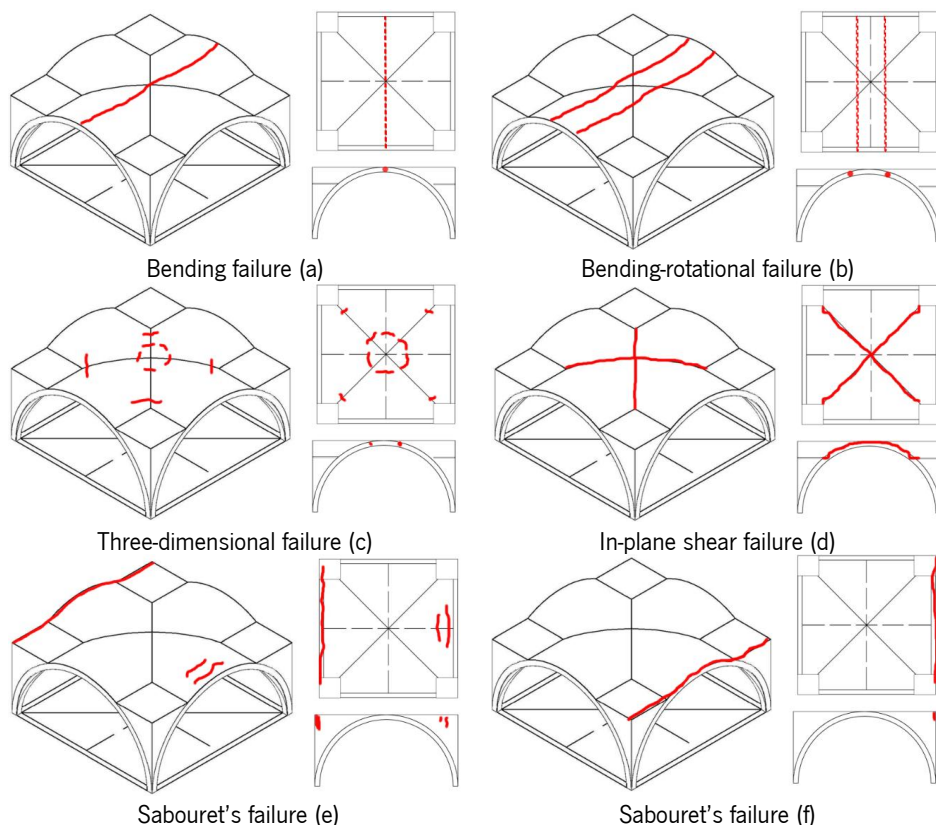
Typical crack failure in the masonry cross vaults in 3D axonometric view, elevation, and plan.
